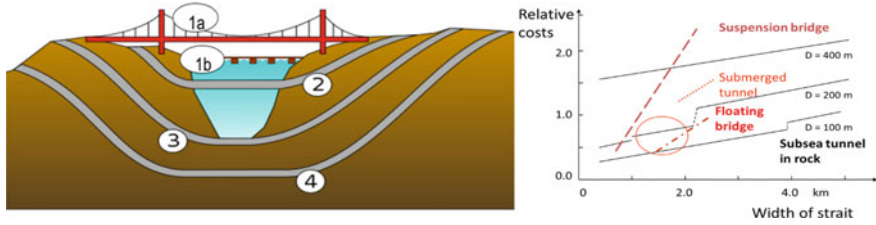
Indicative relative costs of strait crossing based on tunnel in the ground (rock), submerged floating tunnel and floating bridge or free span suspension bridge for a fjord depending on its width and a depth *D*. Adapted after [7]
